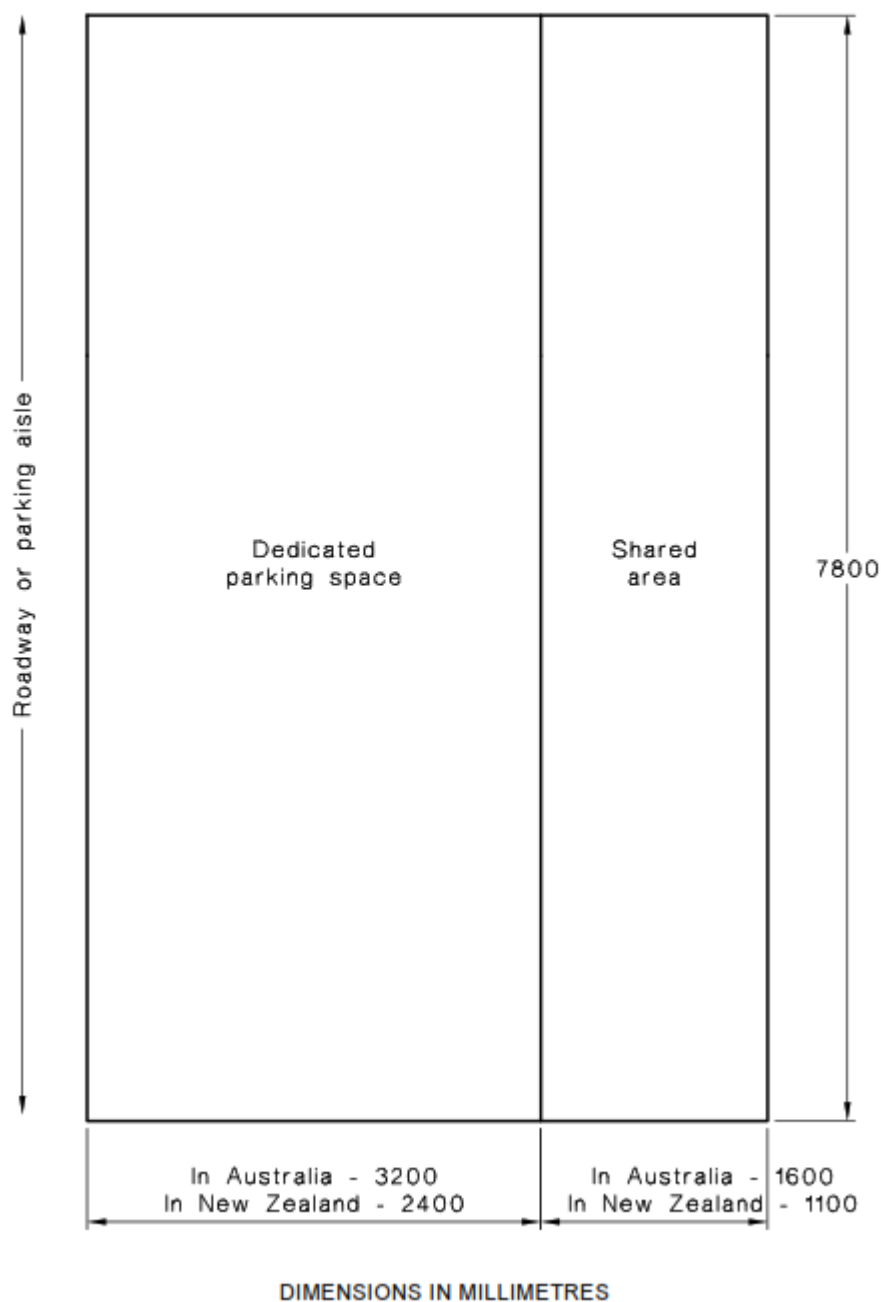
Typical Dimensions of Parallel Parking Spaces
